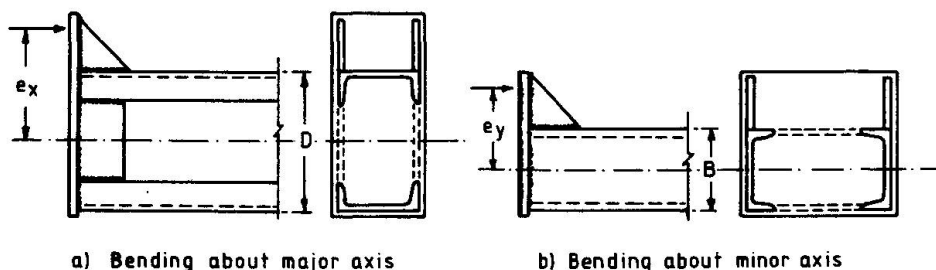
DETAILS OF COLUMN ENDS SUBJECTED TO LARGE ECCENTRICITIES
